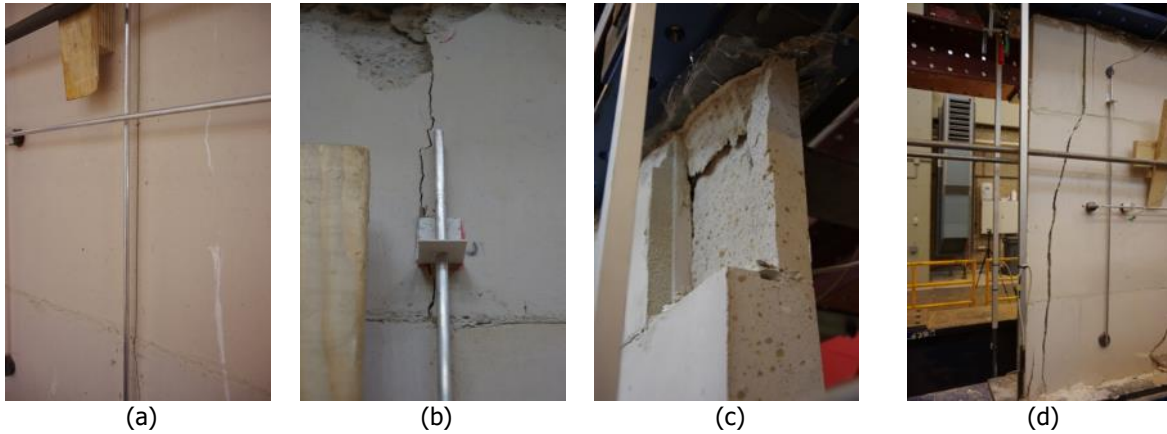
Crack pattern of specimen TUD_MAT-51b tested under vertical compression test: (a) cracking of the central bed joint; (b) cracking and spalling; (c) splitting; (d) side failure.
